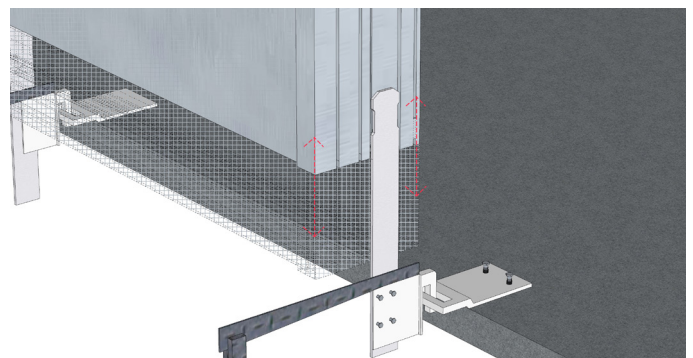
Tolerances in the assembly of TE unitized system
